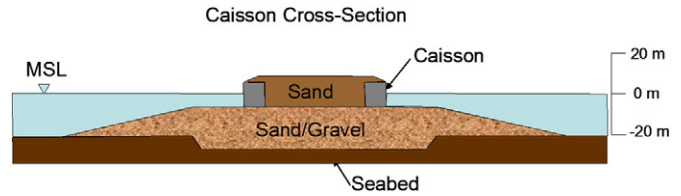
Example caisson cross-section. A drilling rig would have been located on the sand fill or steel deck of the caisson.
